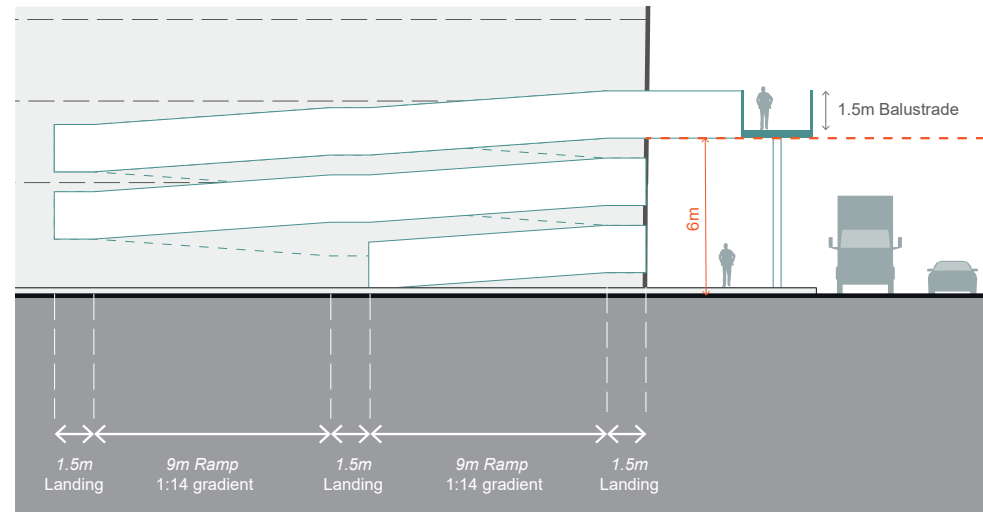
6m Height Ramp, Elevation (typical plan see section 7-1 fig.14)
